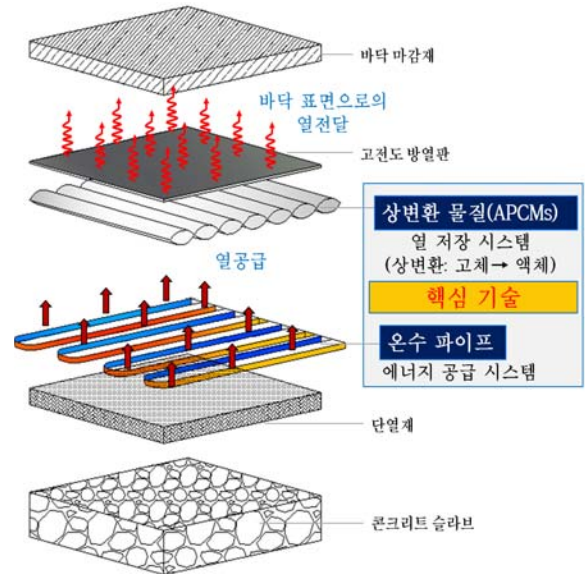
Schematic of under-floor heating system using PCM and hot water system
